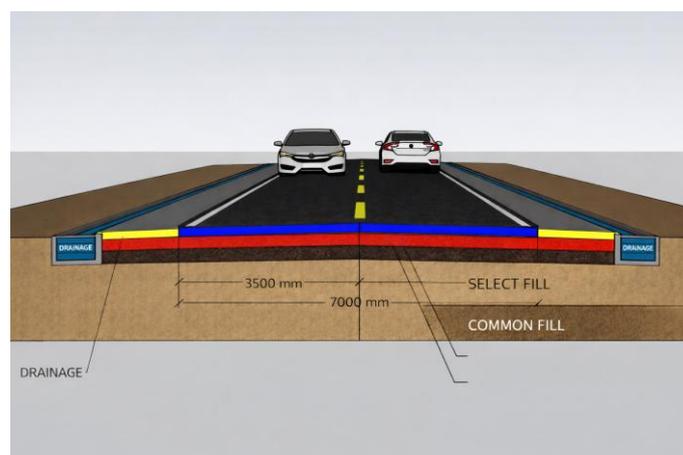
Pavement structure with extended Class B subbase toward drainage channel.
